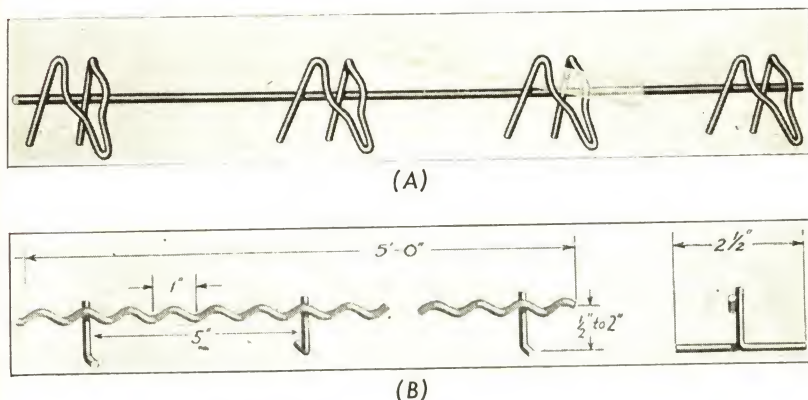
At (A), Snap-in Slab Spacers; at (B) Corrugated Slab Spacers
